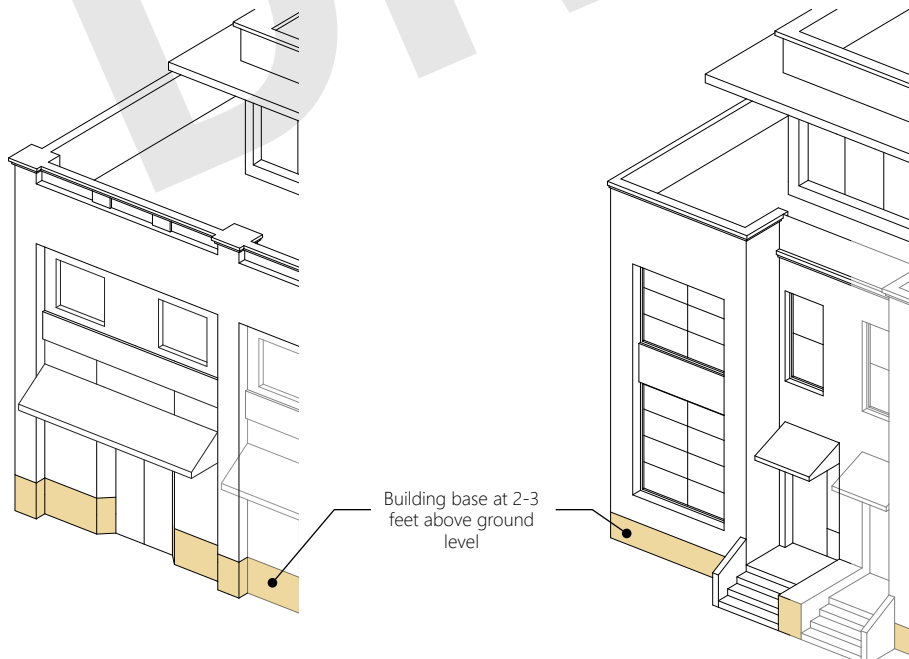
Masonry Base location at mixed-use building (left) and multi-family building (right)
